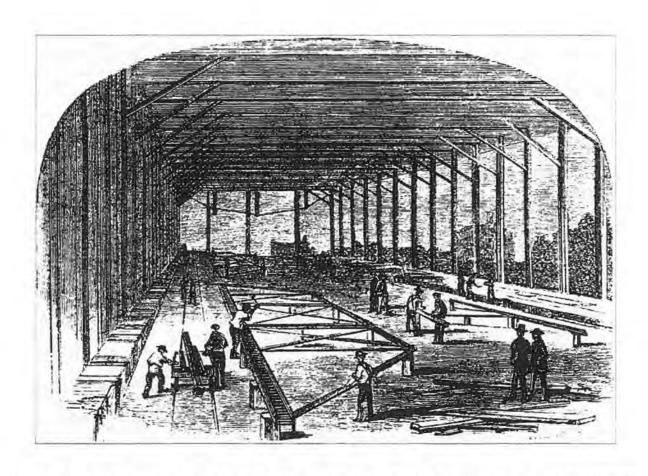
Trial assembly of a bridge truss in the shop, c. 1872. (Source: Victor C. Darnell, Directory of American Bridge-Building Companies, 1840-1900 [Washington, D.C., 1984]).
